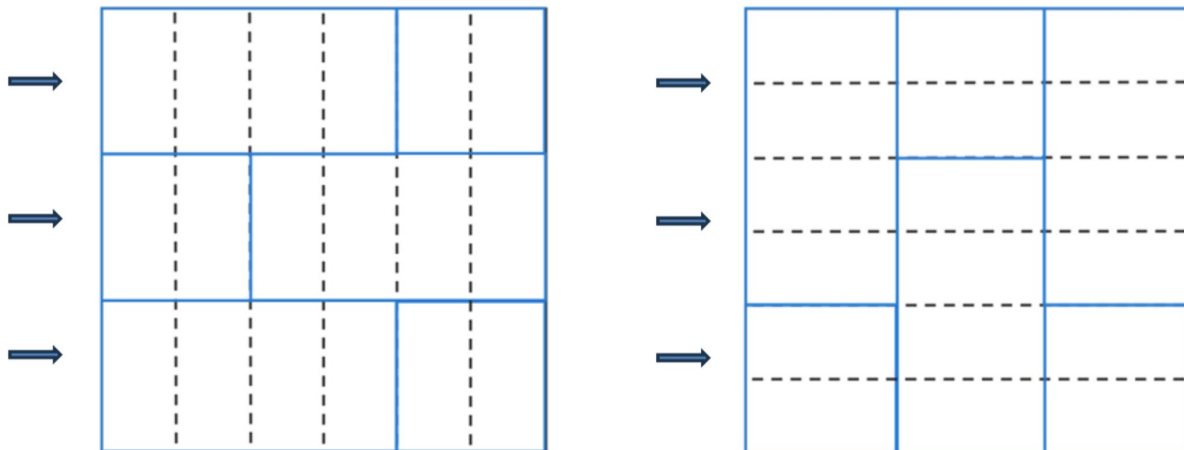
CANTILEVER DIAPHRAGM CONFIGURATION FOR LOAD APPLIED PERPENDICULAR TO JOISTS (LEFT) AND PARRALLEL TO JOISTS (RIGHT)
